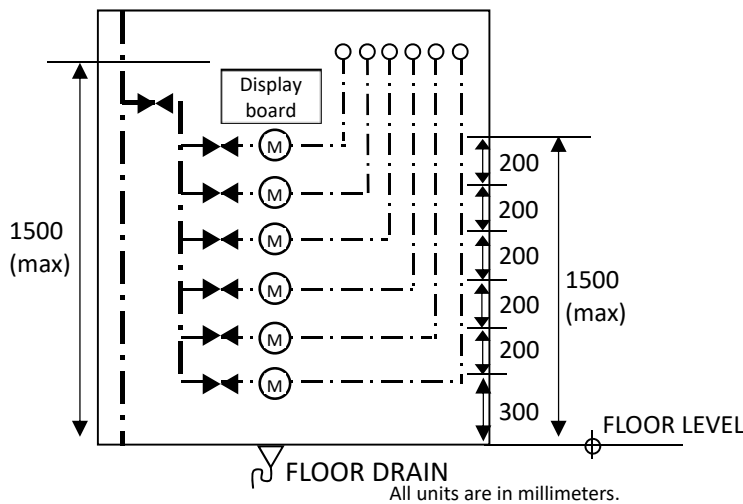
Typical layout of 15mm meter position in a meter box/chamber/room
